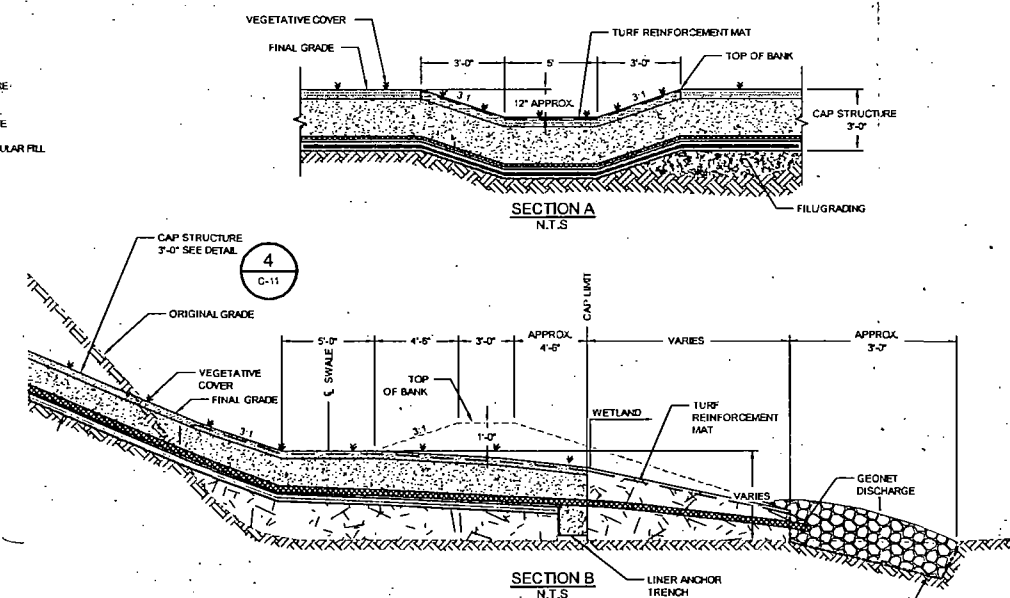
TYPICAL GEOWEB STABILIZED SWALE
